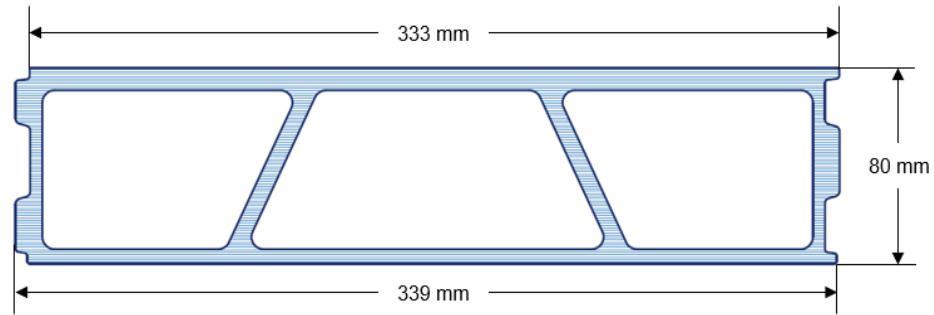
Cross-section of an FRP bridge deck profile (Fiberline 2017)
